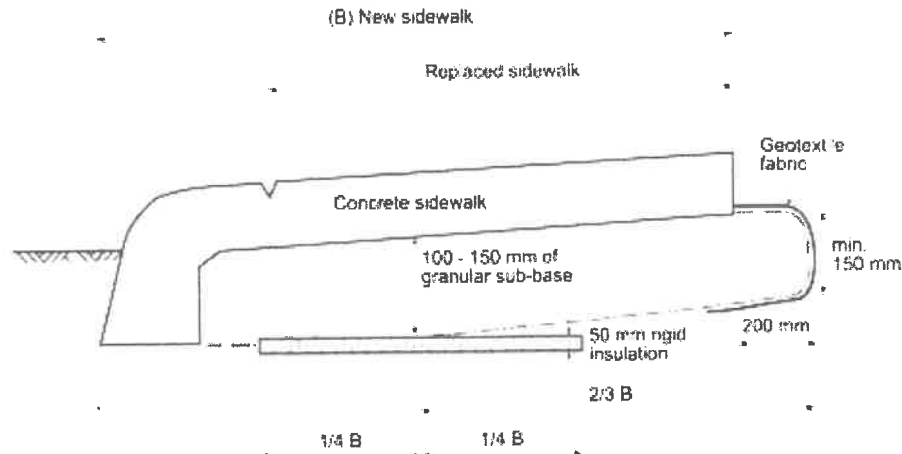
Typical cross-section of sidewalk with rigid insulation-enhanced sub-base.
